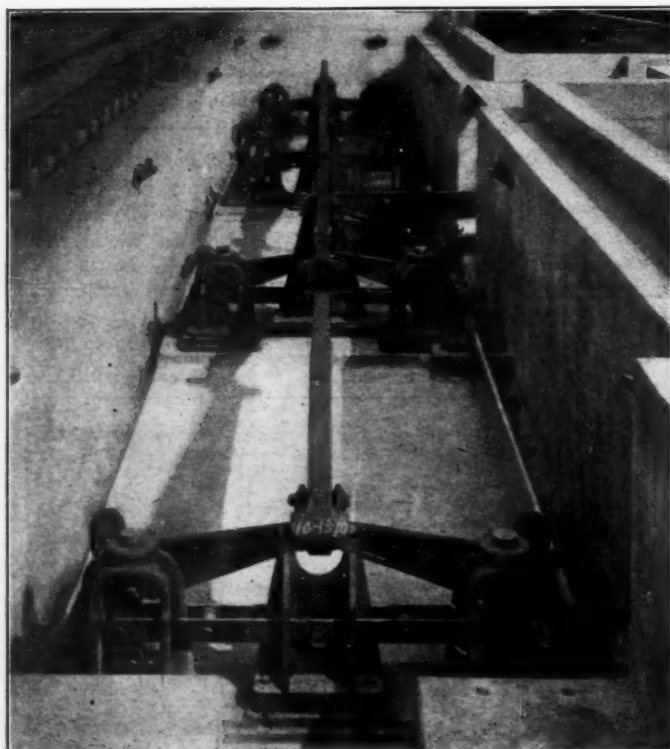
Torsion Shaft and Toggle Levers for Operating the Relieving Gear.
